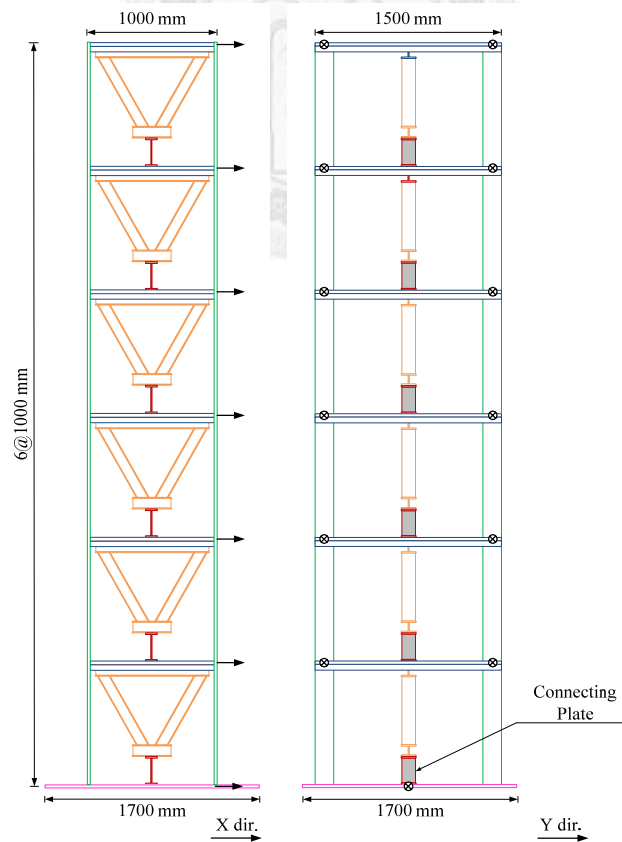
Side views of the 1/4-scale 6-story steel building structure.
